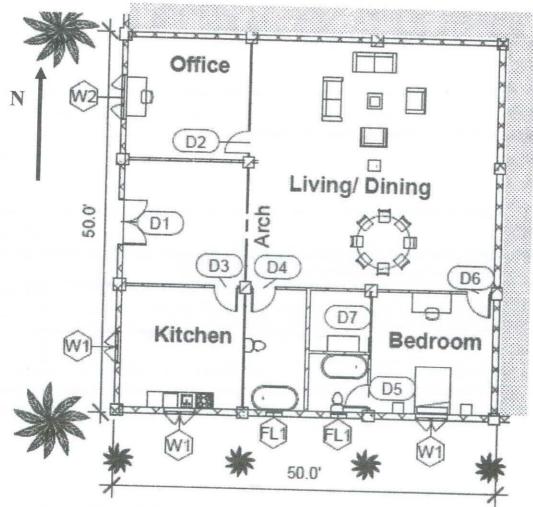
Building Layout of the Executive Deluxe Small House Unit
